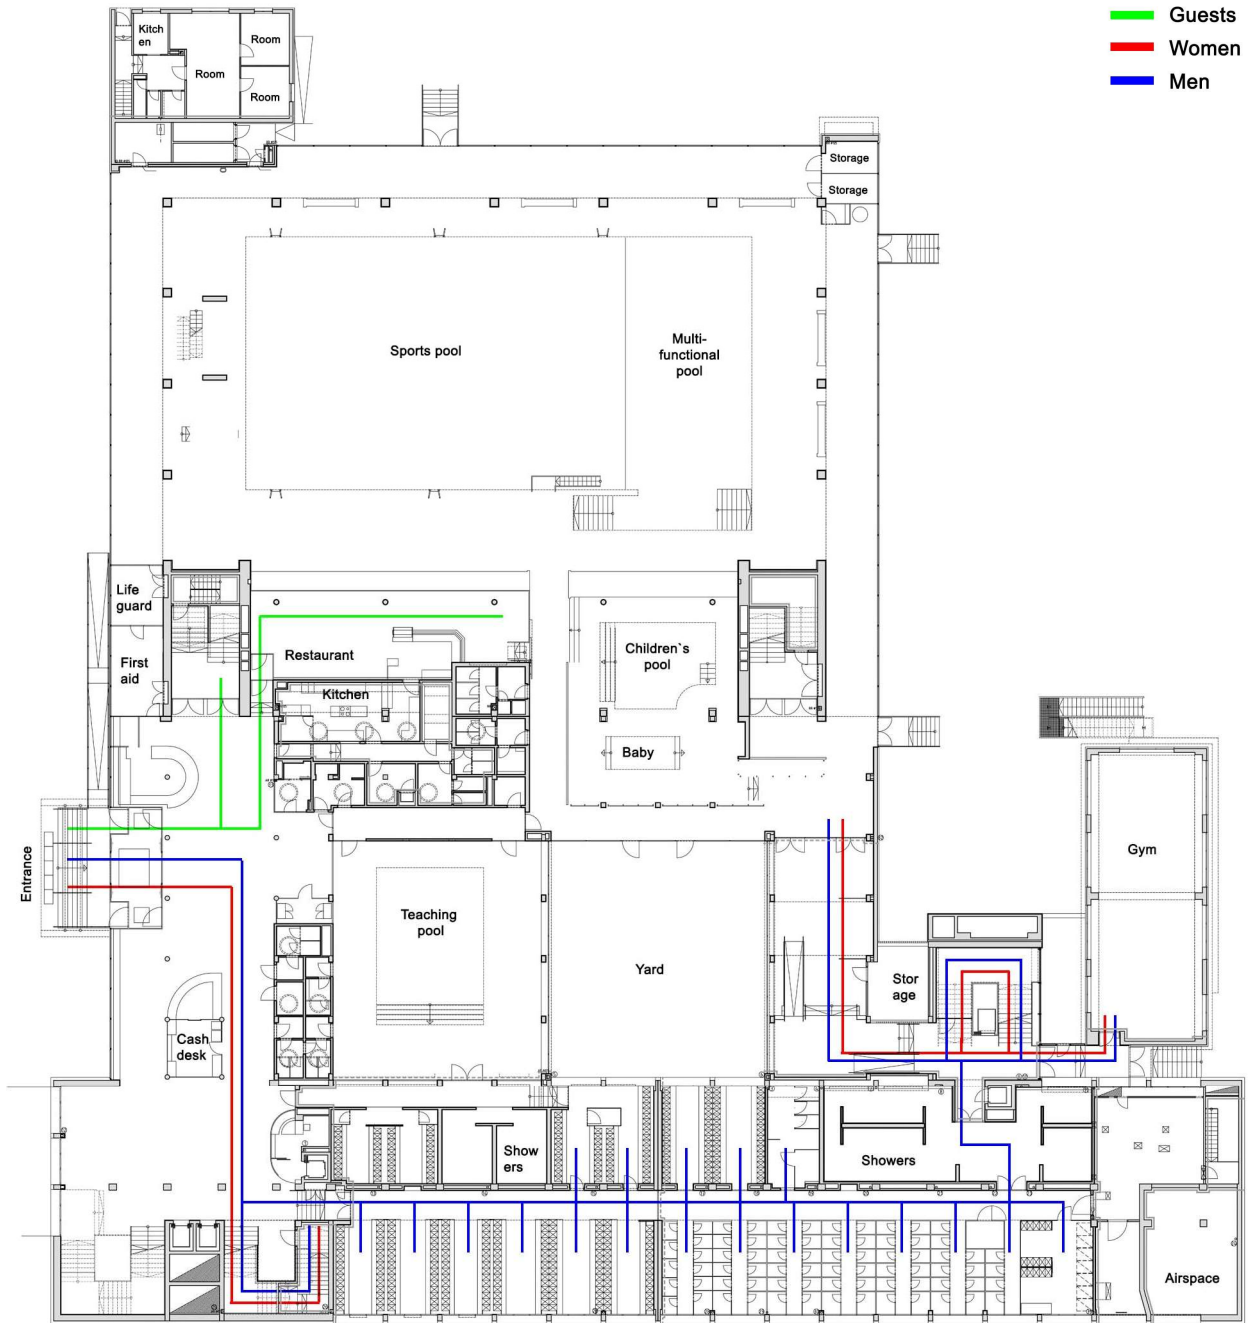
Ground floor plan Floridsdorfer swimming hall 1:500 (source: MA 44, 2016/17)
